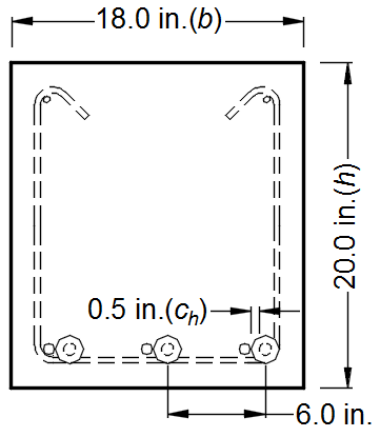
Lapped bars with clear spacing of 0.5 in.
